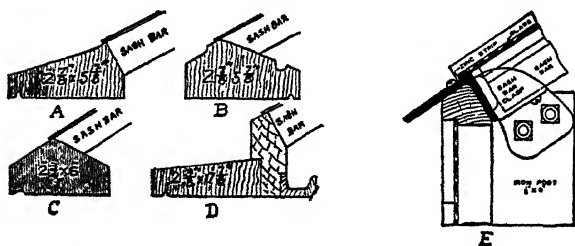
Types of eave plates. A, B, C, and D are wood; E is a metal plate.
